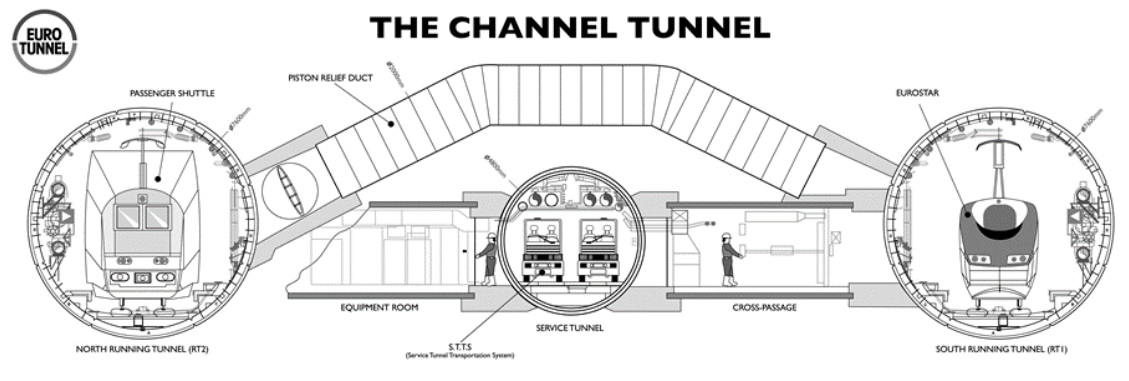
Cross section of the Channel Tunnel (source: [Getlink](#) (2 September 2019))
